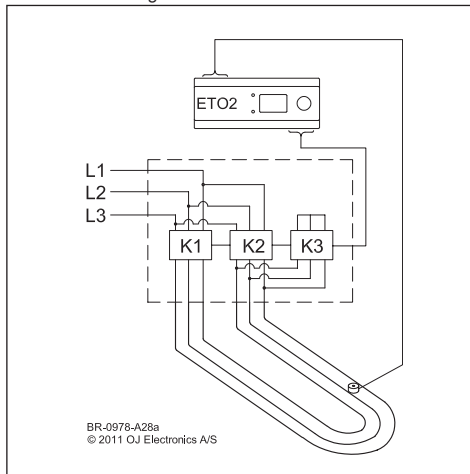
Advanced 2-step connections. 1/3 power on heating cables in afterrun.
